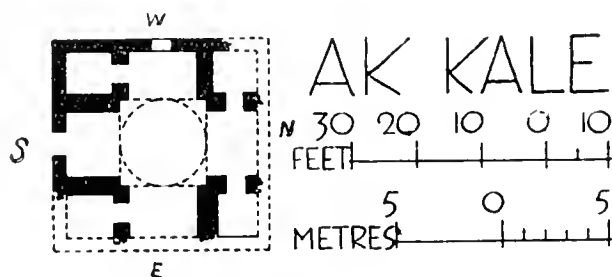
Ground plan of cruciform building at Ak Kale.
